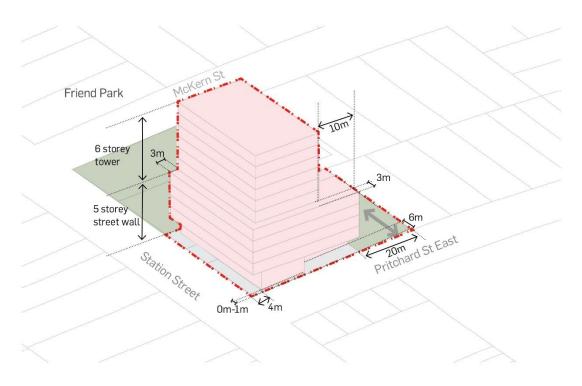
Corner of Pritchard Street and Station Street Precinct – 3D Conceptual Diagram - north-south section
